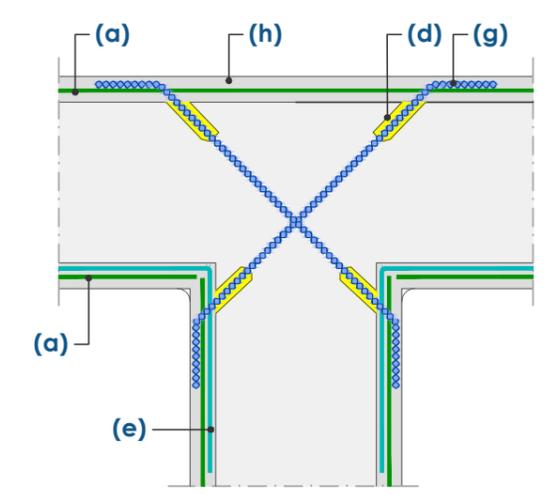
DETAIL OF MASON'S MALE CONNECTIONS - scale 1:10
